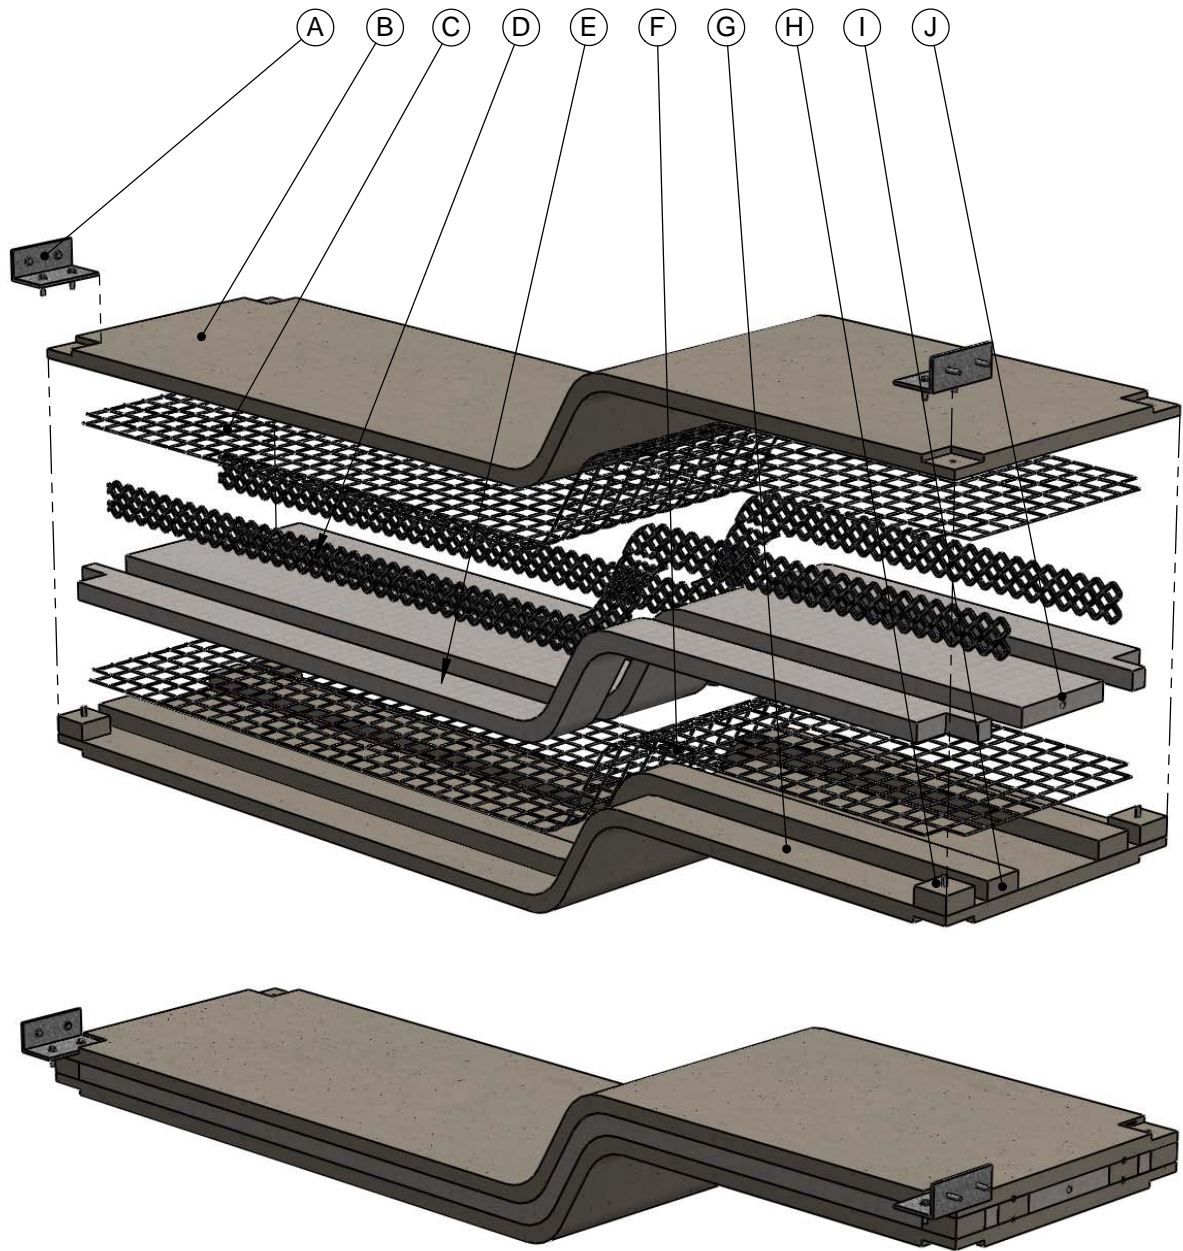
Exploded Perspective Detail View of Typical Wall Panel
